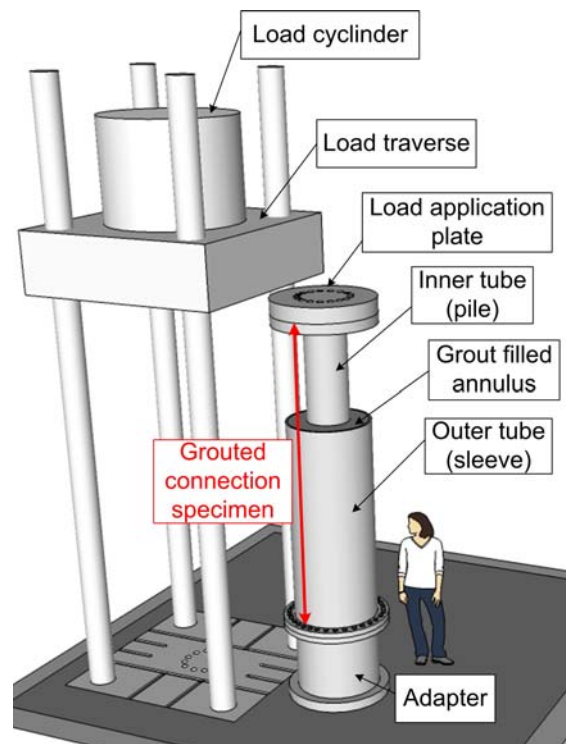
Large-scale test set-up and grouted connection specimen.
